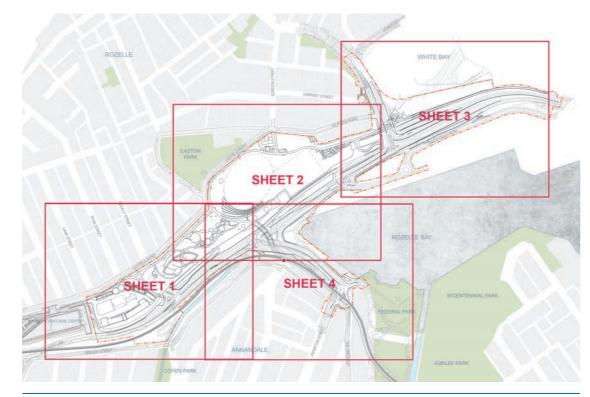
Rozelle - Landscape Strategy Key Plan
